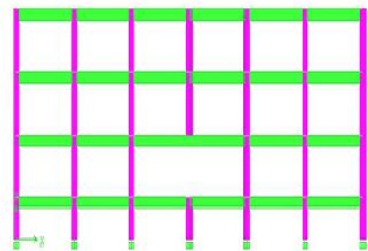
Columns removed in outer face of exterior frame in ground floor (elevation view)
